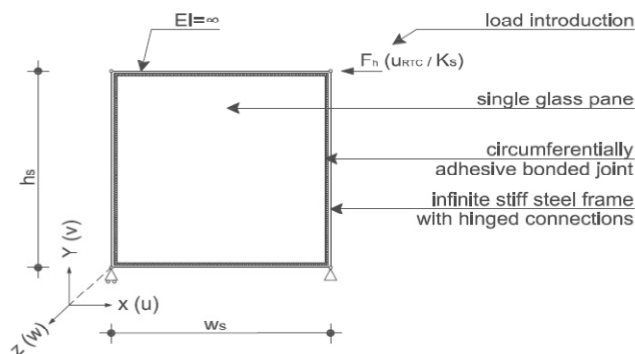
Isolated box from a stabilizing bay, called the system.
